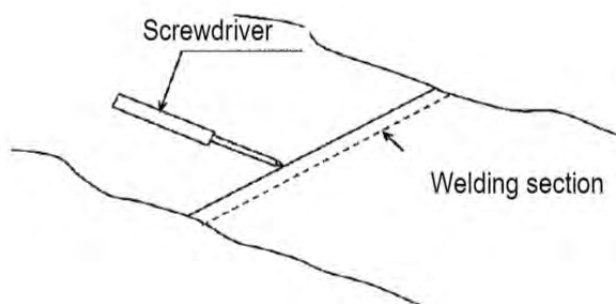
Inspection Example of a Joining Section 1 (using a screwdriver)
